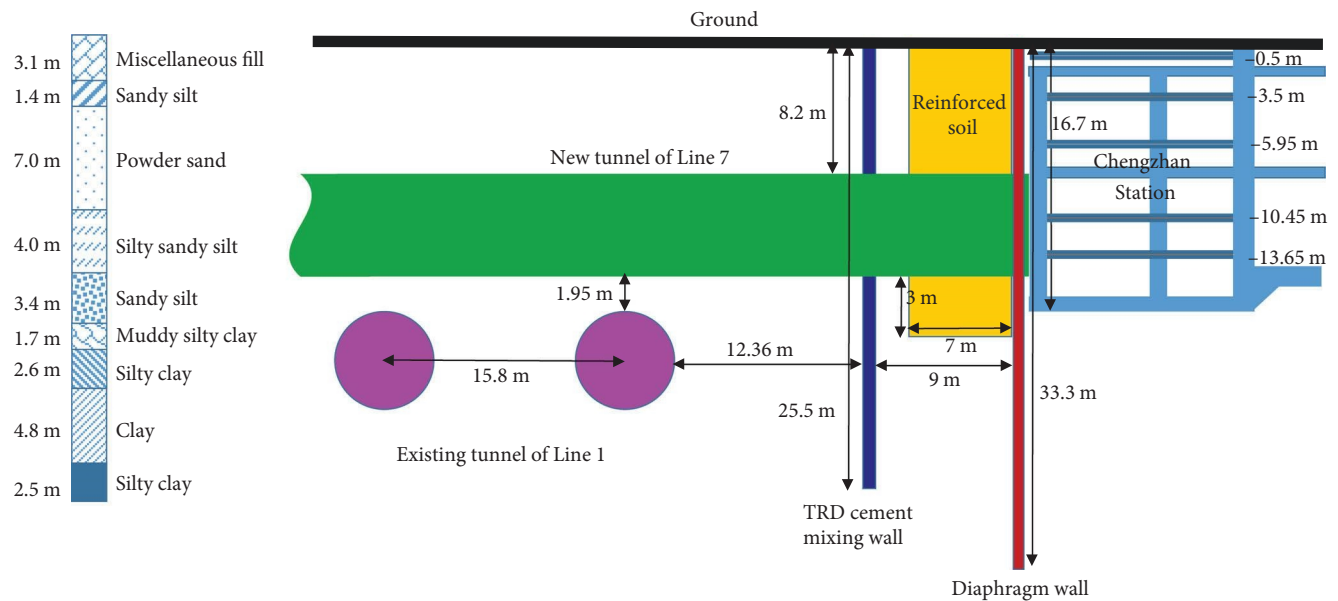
Layout diagram of the new pit and tunnel and the existing tunnel.
